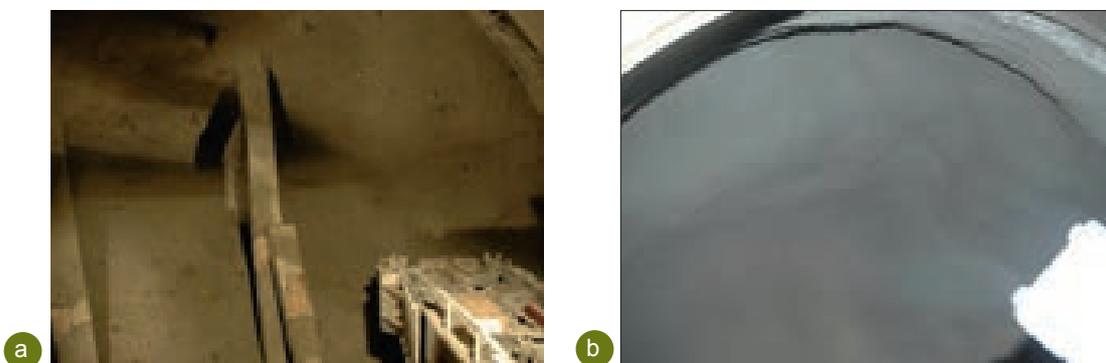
The final front was reinforced with a steel mesh (a) and shotcreted (b).
